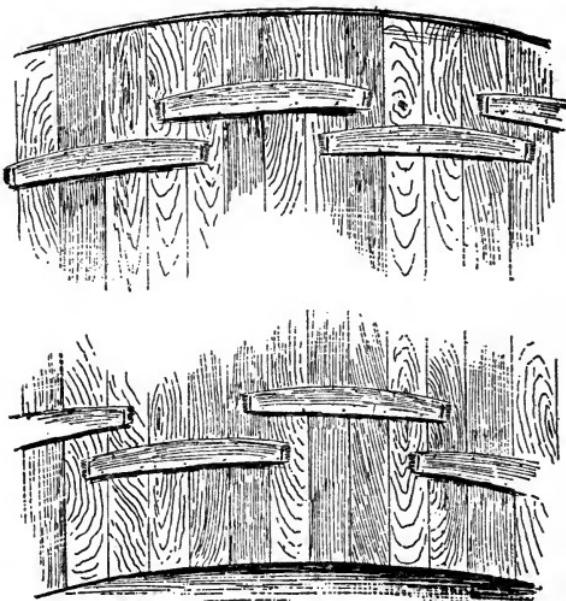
Shows how barrel staves may be used in setting up a silo. They should be removed before the silo is filled.
